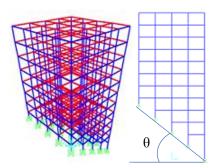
3D & 2D Model of 12 storey stepback building inclined with an angle of 40°
